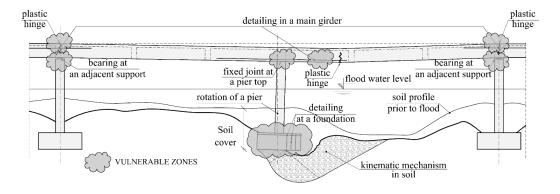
An example of a failure mode due to local scour at a pier - multiple-span RC girder bridge and its vulnerable zones - adapted from (Tanasic & Hajdin, 2017b)
